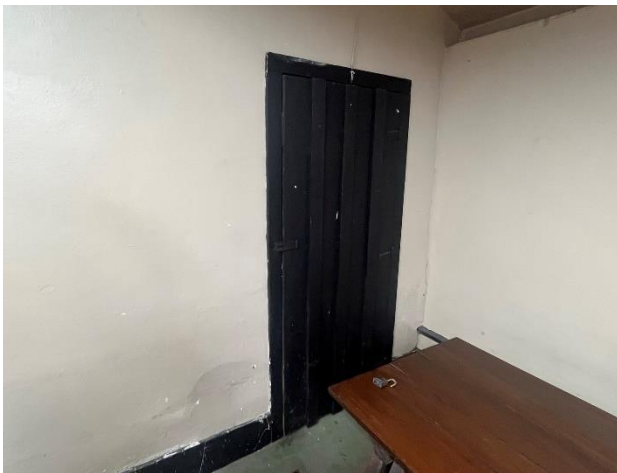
Interior door constructed of vertical boards with wood batten over the joints.
